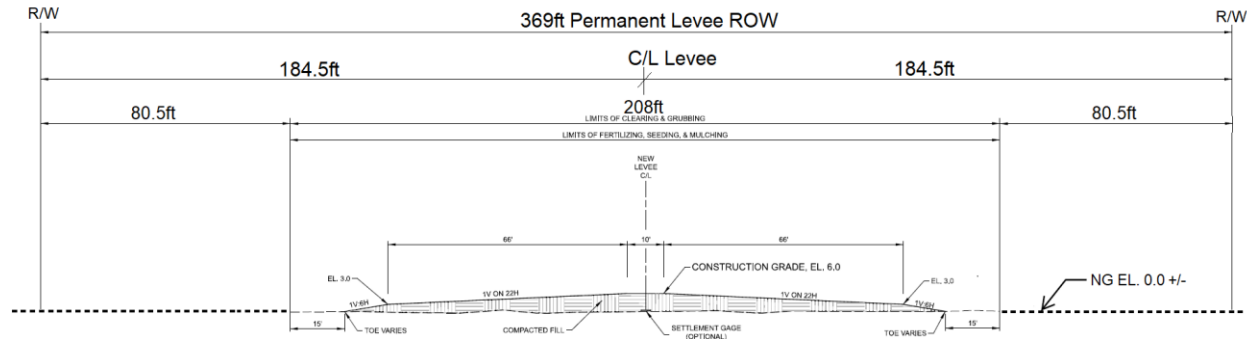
Typical cross-sectional dimensions for levee sections between Stations 3684+00.00 and 3552+00.00
